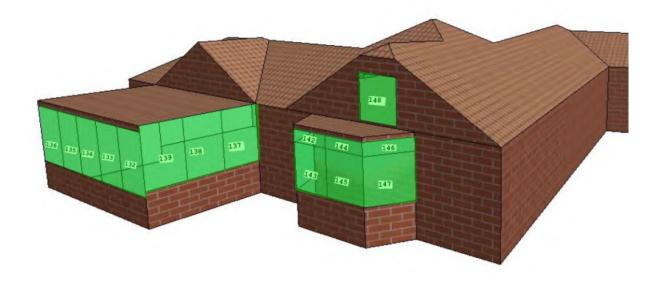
Window Maps of 32 Daleham Gardens (East Elevation)
